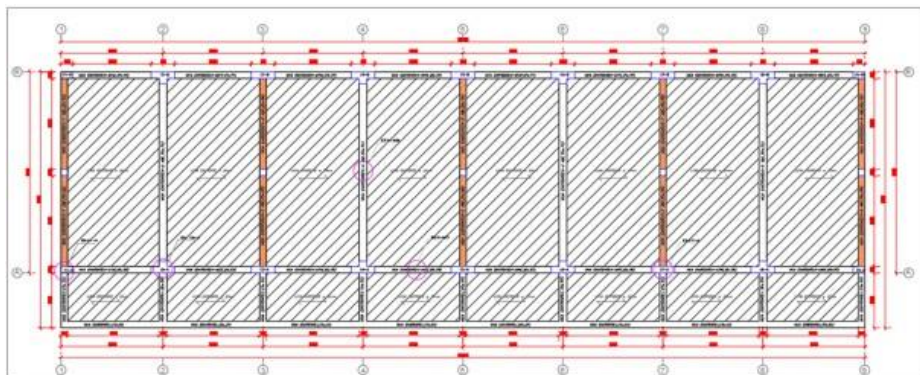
Block I-Systemic Type 780 Current-First Level Plant. Note: Own Elaboration
